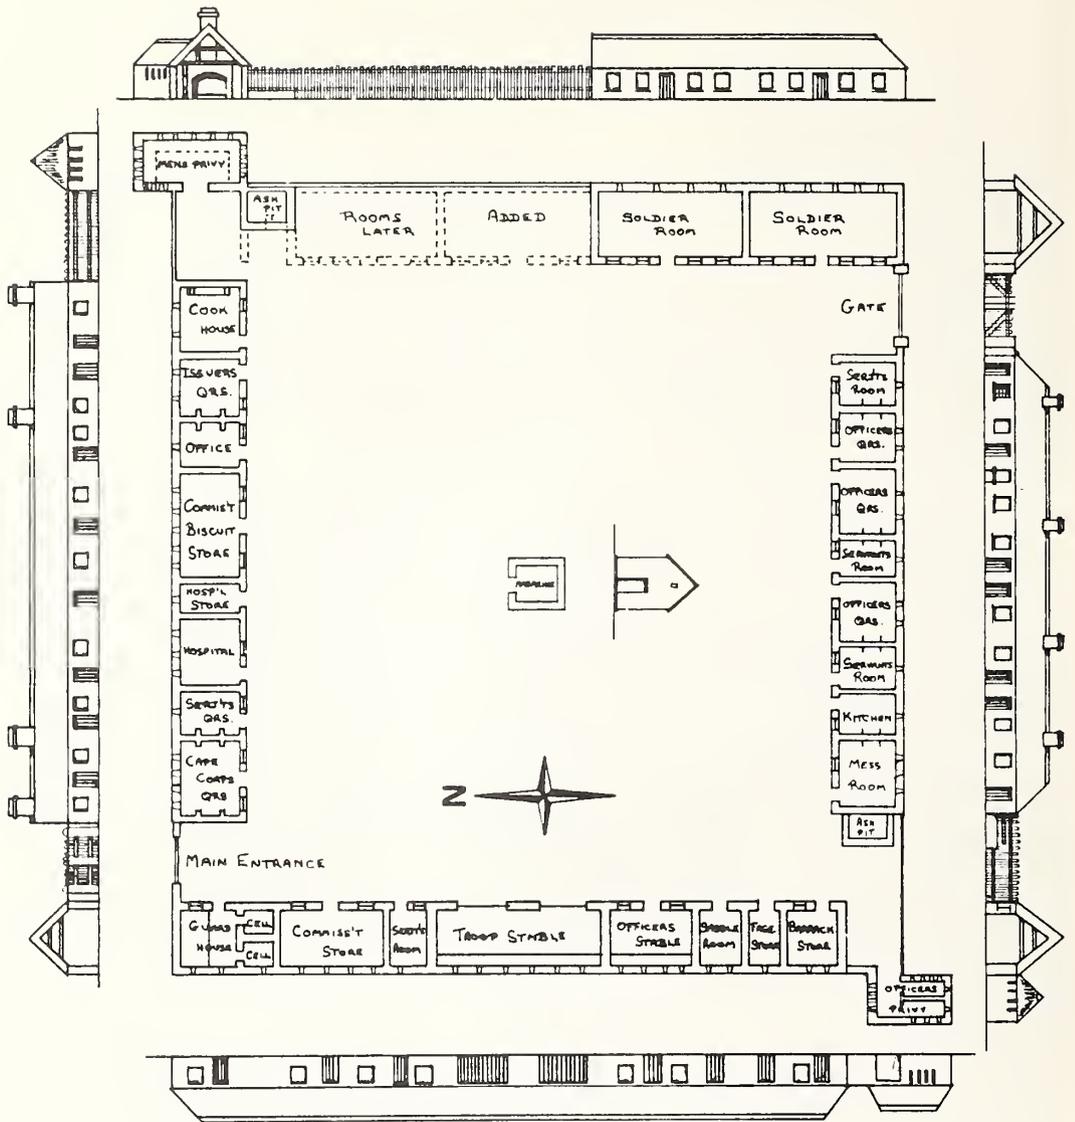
Plan of Fort Murray, 1848, showing the layout of the fort. (Kaffrarian Museum, W 6489)
